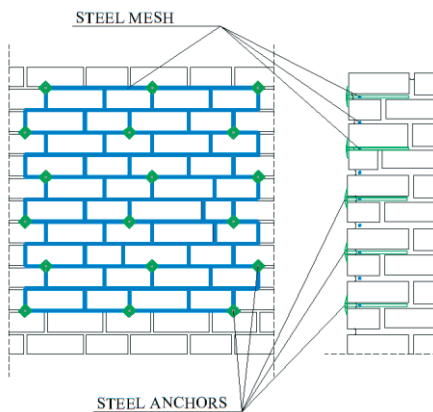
Scheme of the wall's repair using an anchored steel mesh
